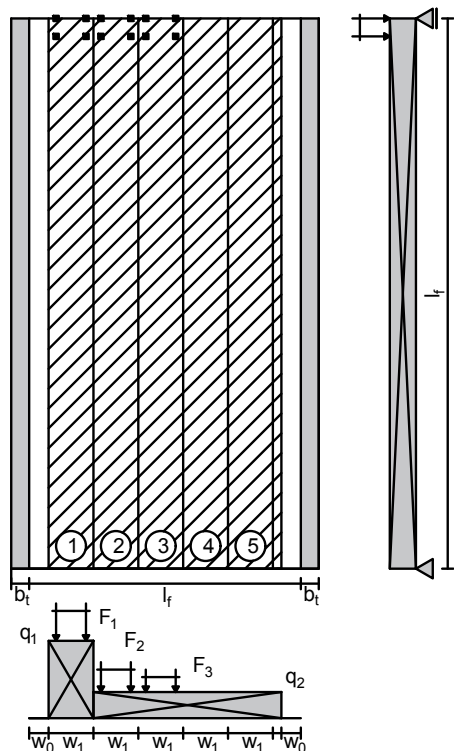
Load situation 2 - traffic load configuration for maximum loads in the side girder at end span
